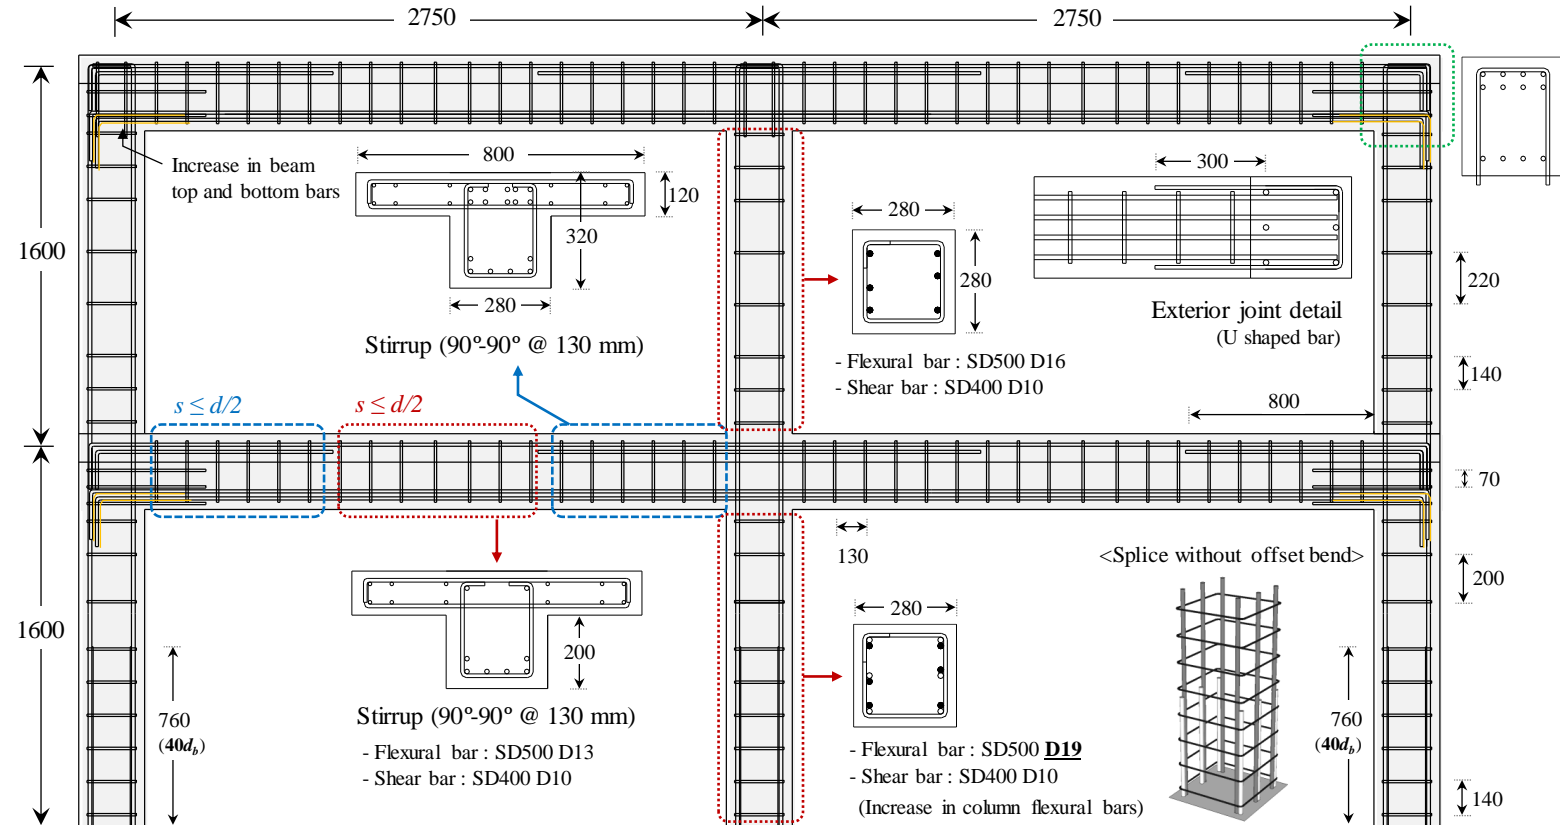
Dimensions and reinforcement details of the intermediate moment frame specimen (A2F)
